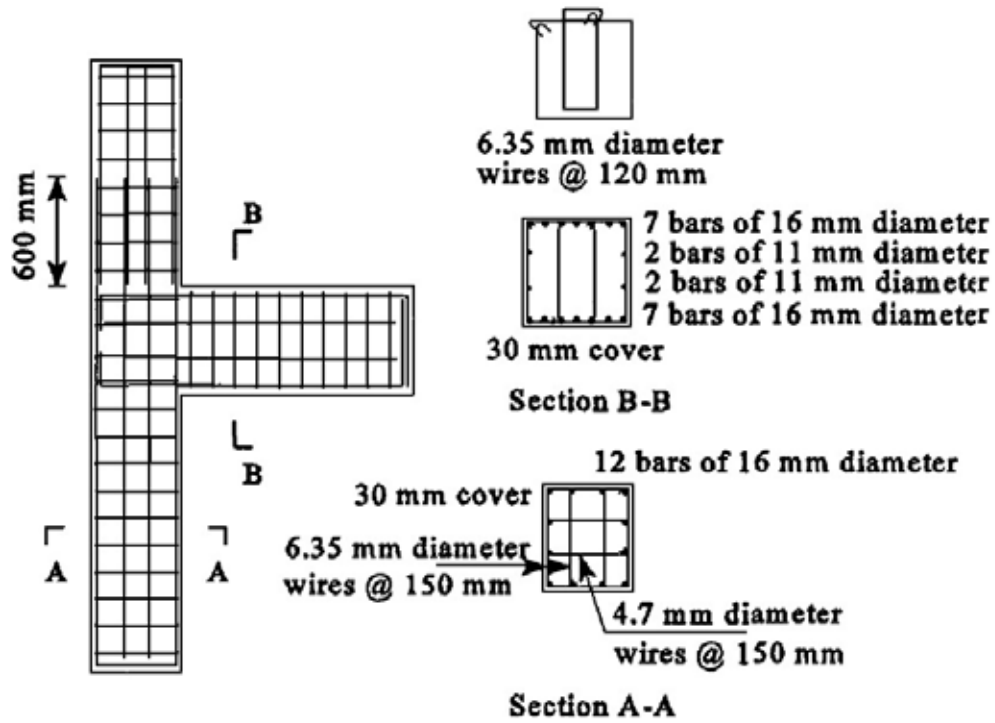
Reinforcement Layout of Beam-Column Assemblage
